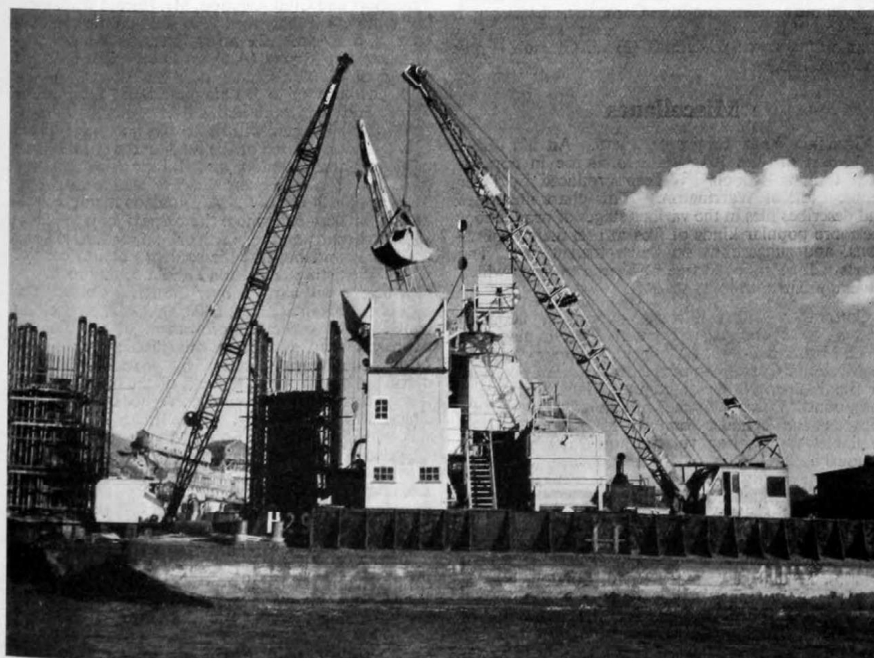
Floating concrete mixing plant "Pacific Mixmaster" capable of batching and mixing 100 cubic yards per hour
